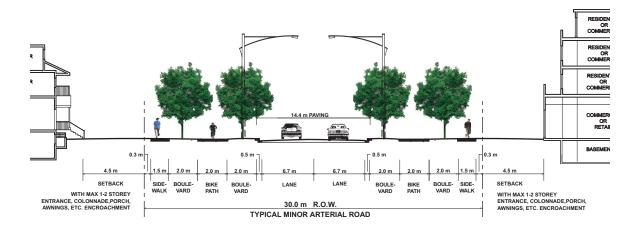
An emphasis on the design of the Louis St. Laurent Avenue streetscape should be made within the Secondary Mixed Use Node mixed use area.
